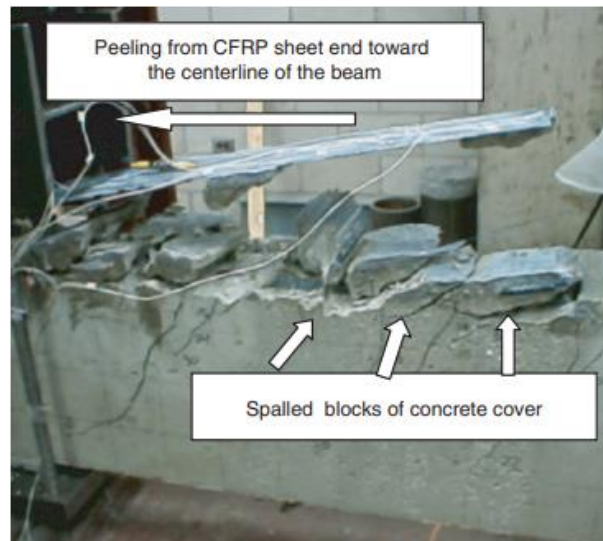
Peeling failure of concrete cover for specimen B2. By: Zhao.
